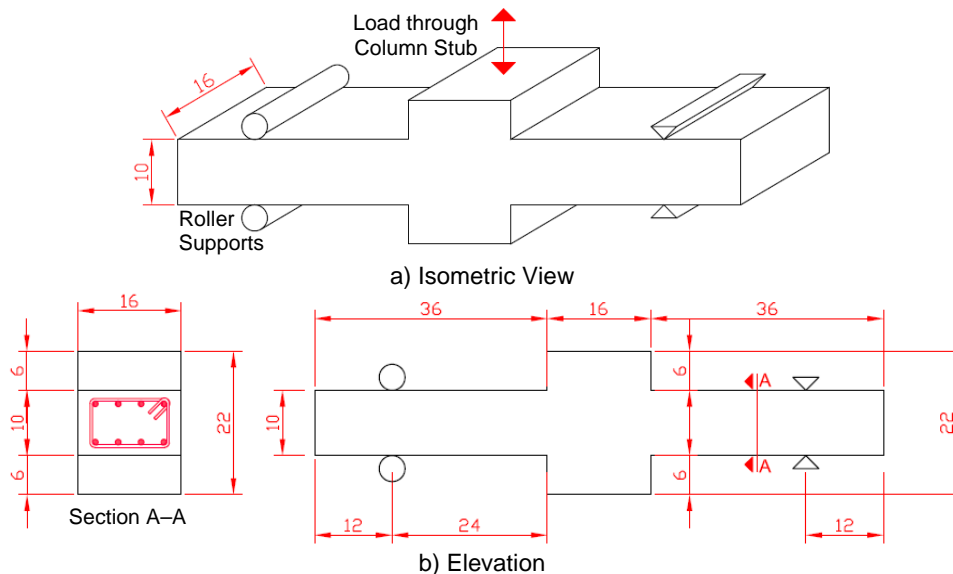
Geometry of a Typical Beam Specimen (dimensions in inch).
